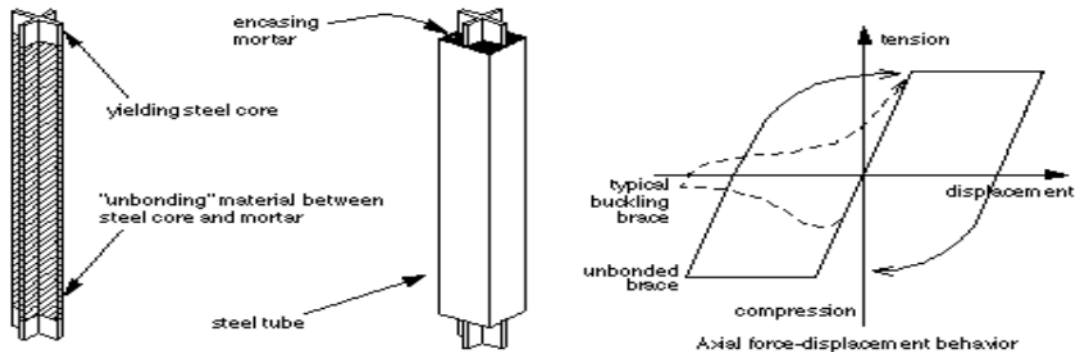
Typical cross section of a BRB and its hysteretic curve (Disarno et al., 2008)
